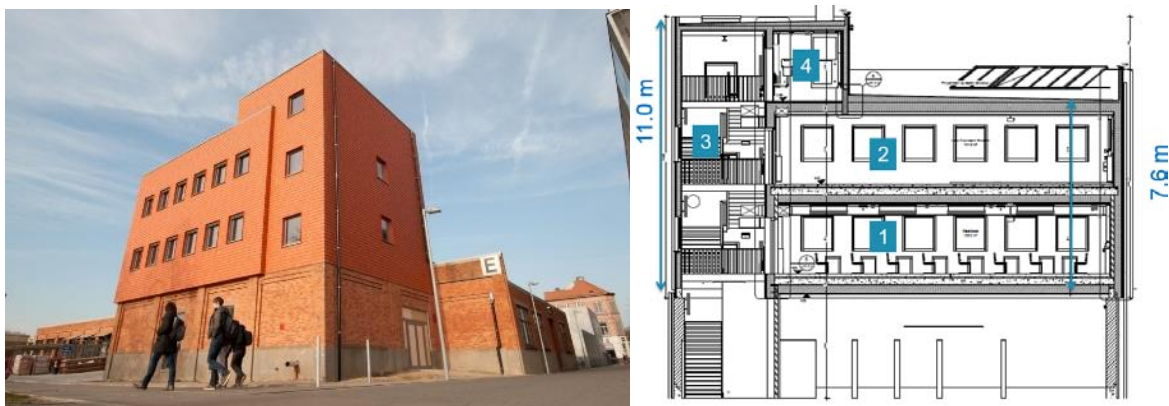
; (left) Impression of the case study building, (right) cross-section of the case study building with 1: lecture room, 2: lecture room, 3: staircase, 4: technical room
